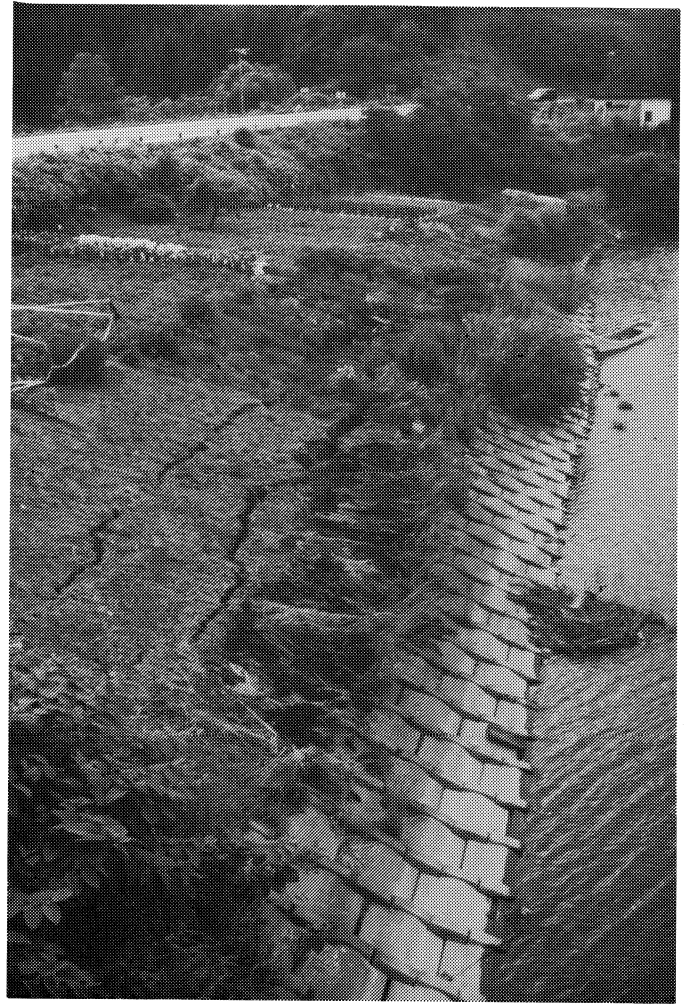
Azabu Bridge--settlement of fill (below the paving) away from a bridge pier due to lateral spreading of the fill into the river.
